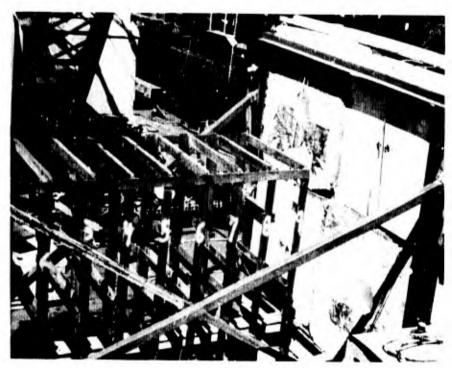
Front View of Support Frame With Pier Simulator Installed
